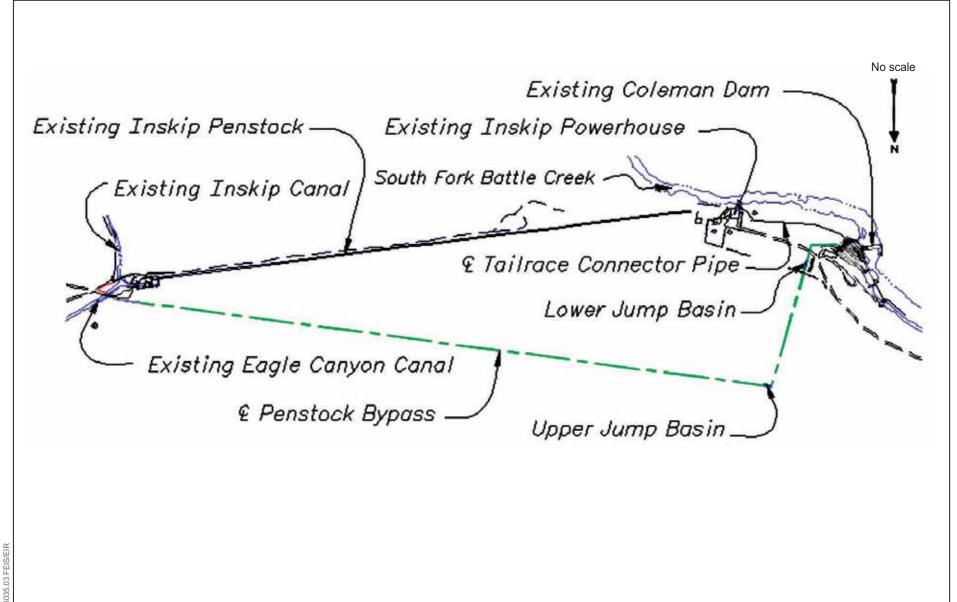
Proposed Facilities for the Coleman Diversion Dam/Inskip Powerhouse Five Dam Removal Alternative
